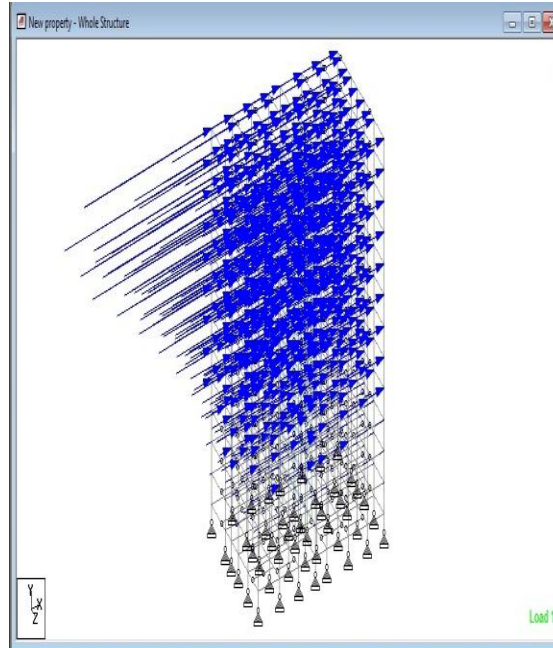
Earthquake Load Udl Showing On Typical Floor
